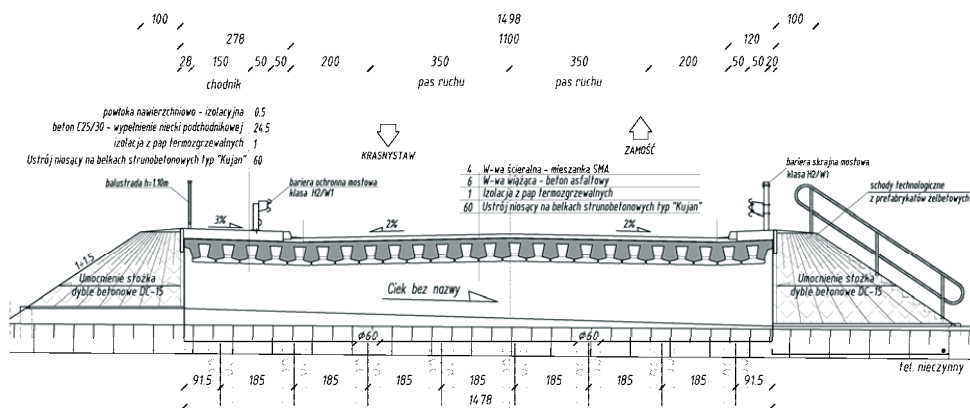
The cross-section of the existing bridge and footbridge in Stary Zamość [12].
